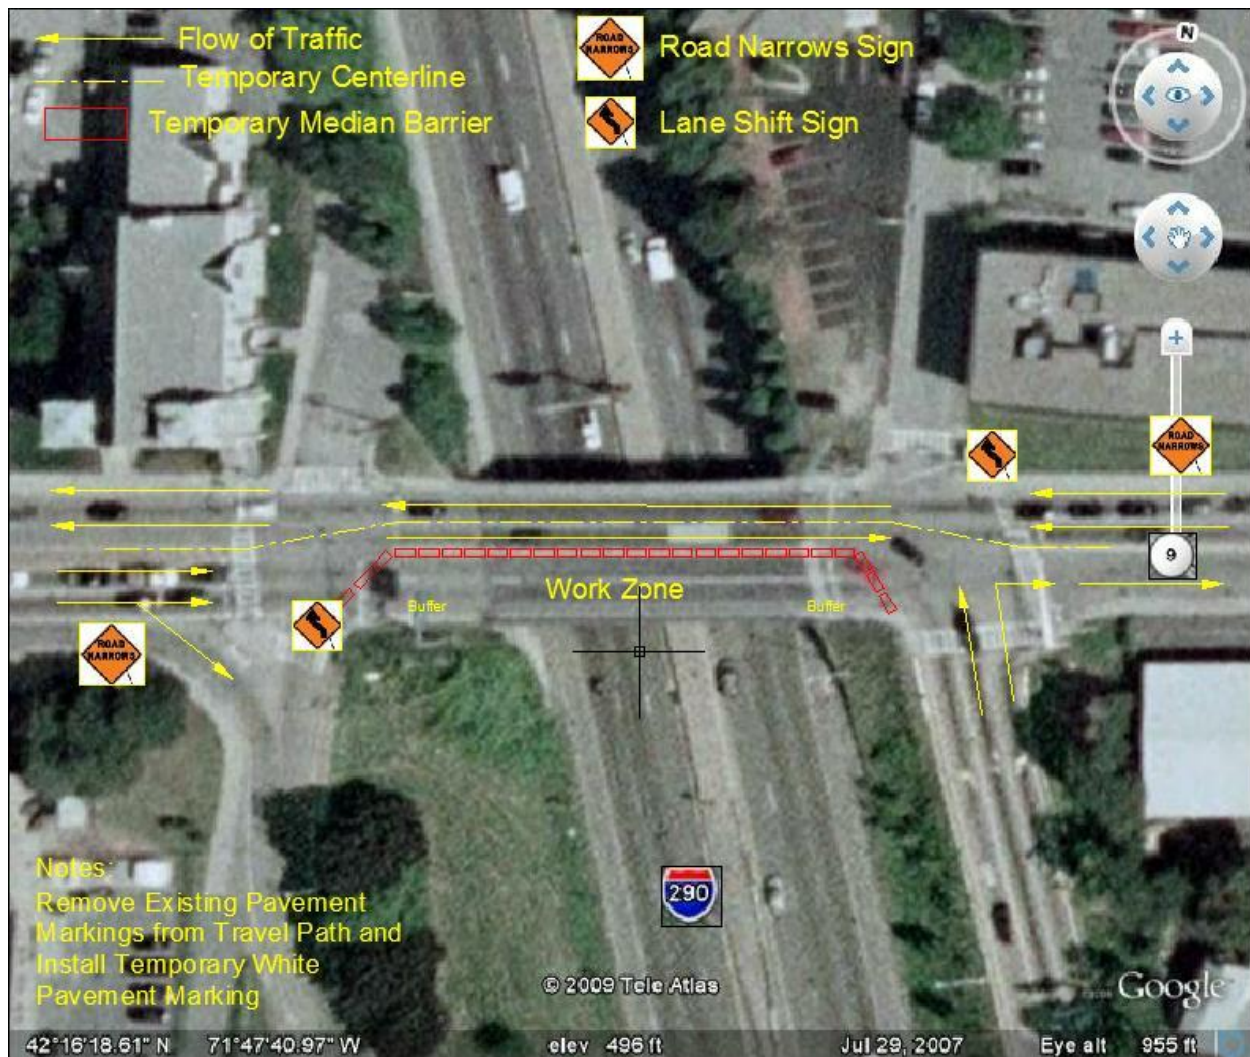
Belmont Street/Route 9 traffic control plan – Stage 1
